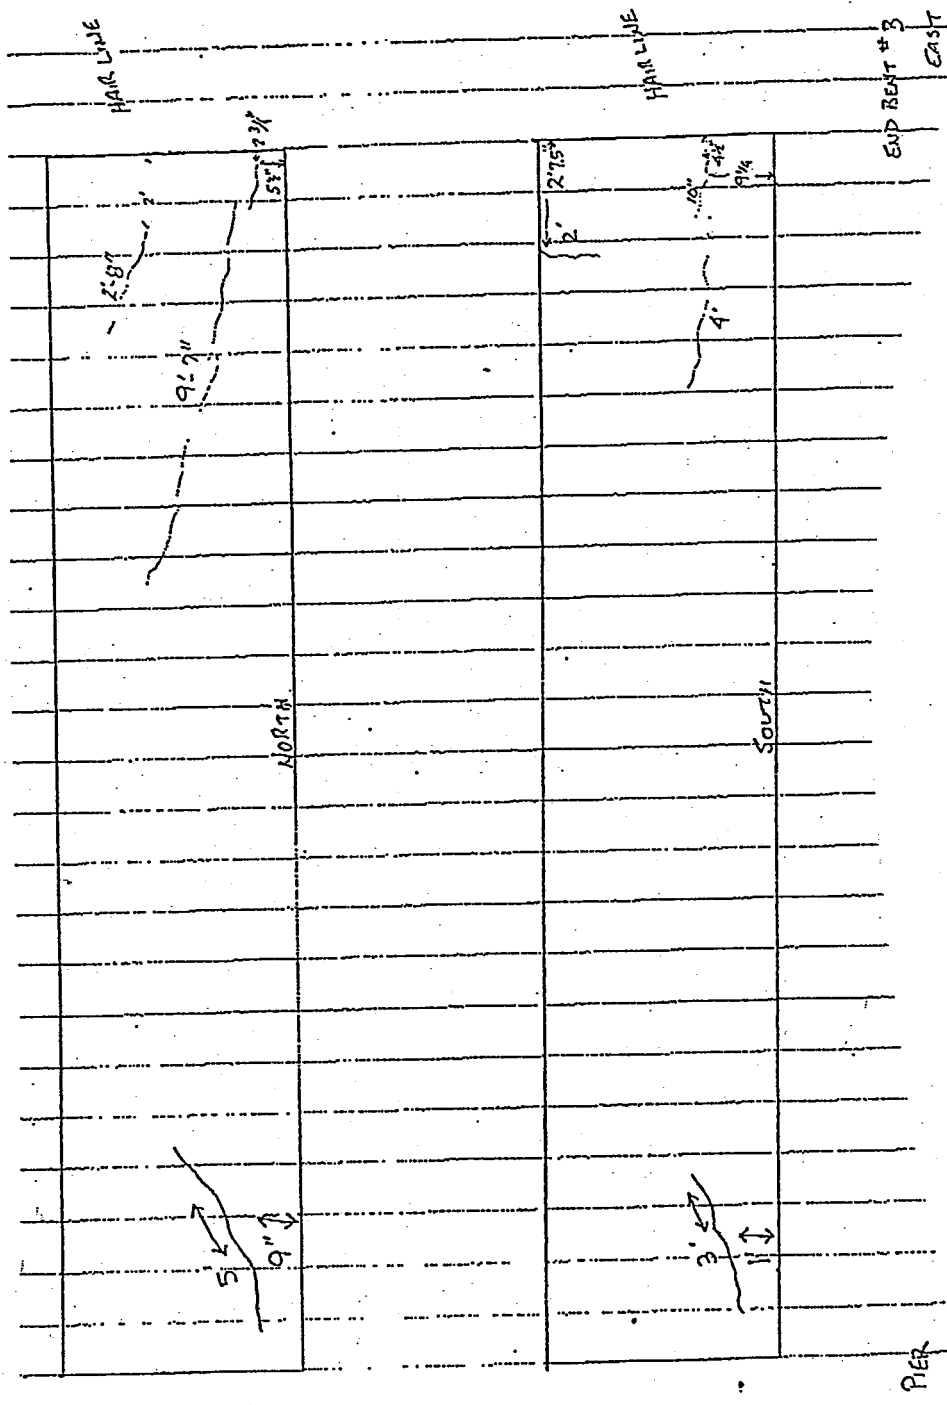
Crack of North Interior Girder over I-75 NB
